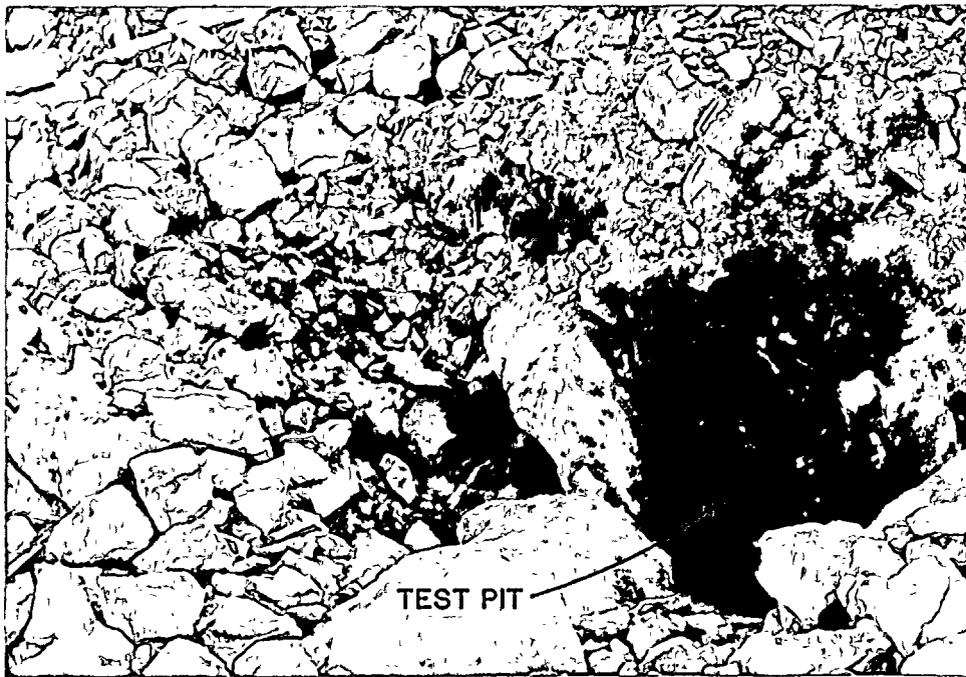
East Revetment, looking west, viewing armor stone slope and 4 to 9-inch fines on slope.
